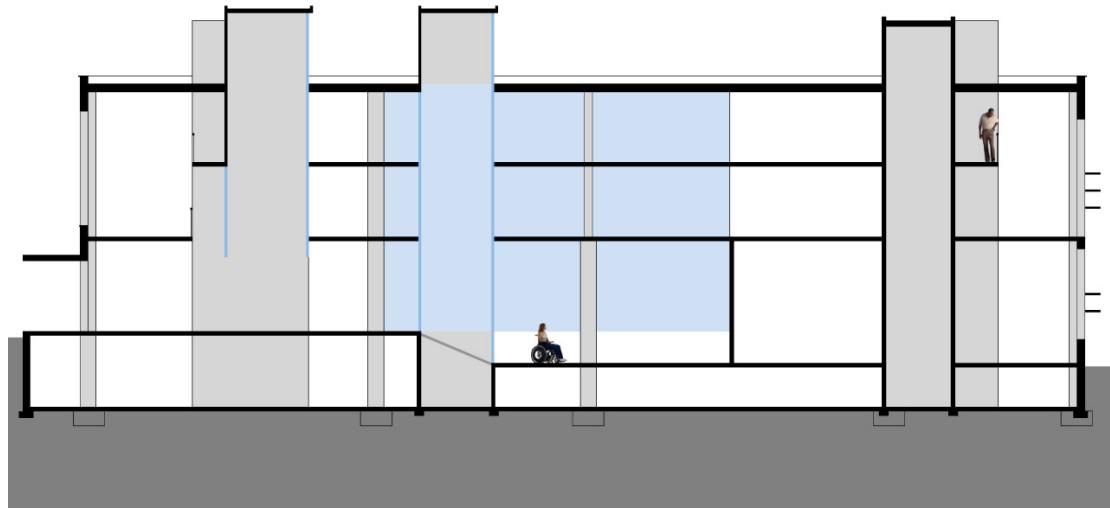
Longitudinal Section. Note translucent glass wall, which is an illumination and wayfinding device, the sun shading on the south wall, and shaft solar chimneys and roof monitors.
